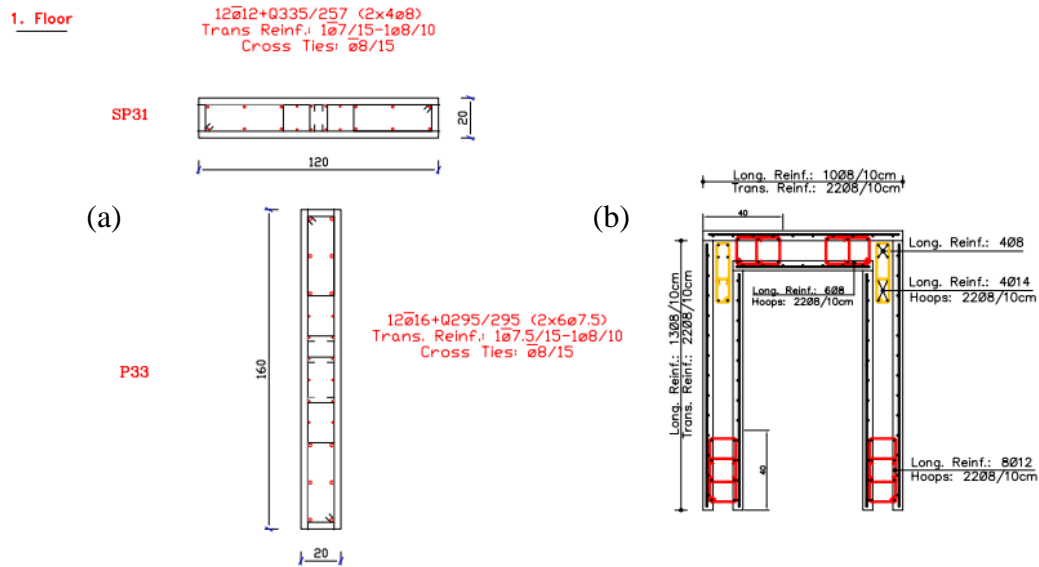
"P33" and "SP31" Double Wall Conversion; (a) Monolithic Wall, (b) Equivalent Double Wall
